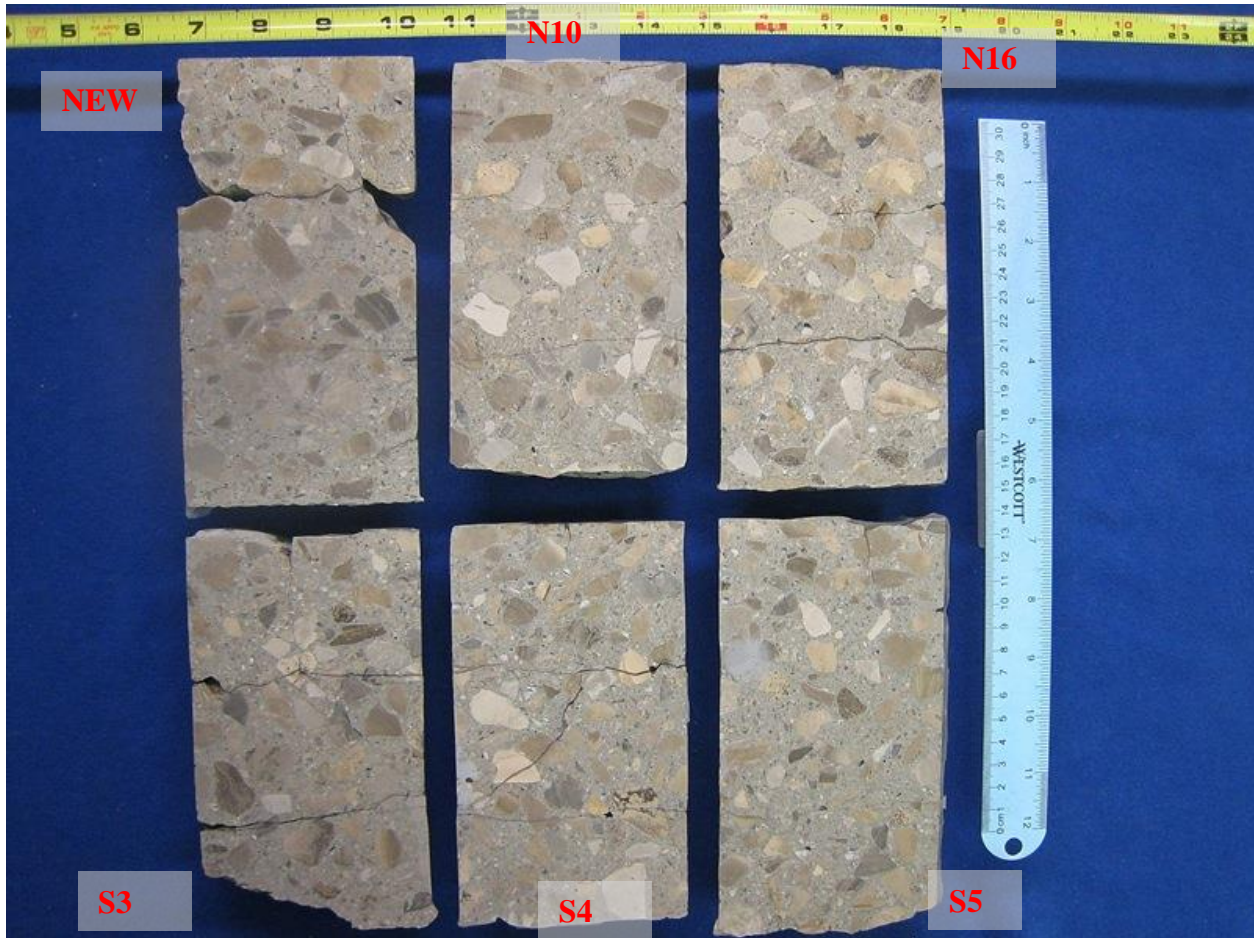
Lapped core sections illustrating the overall similar appearance of the concrete.
